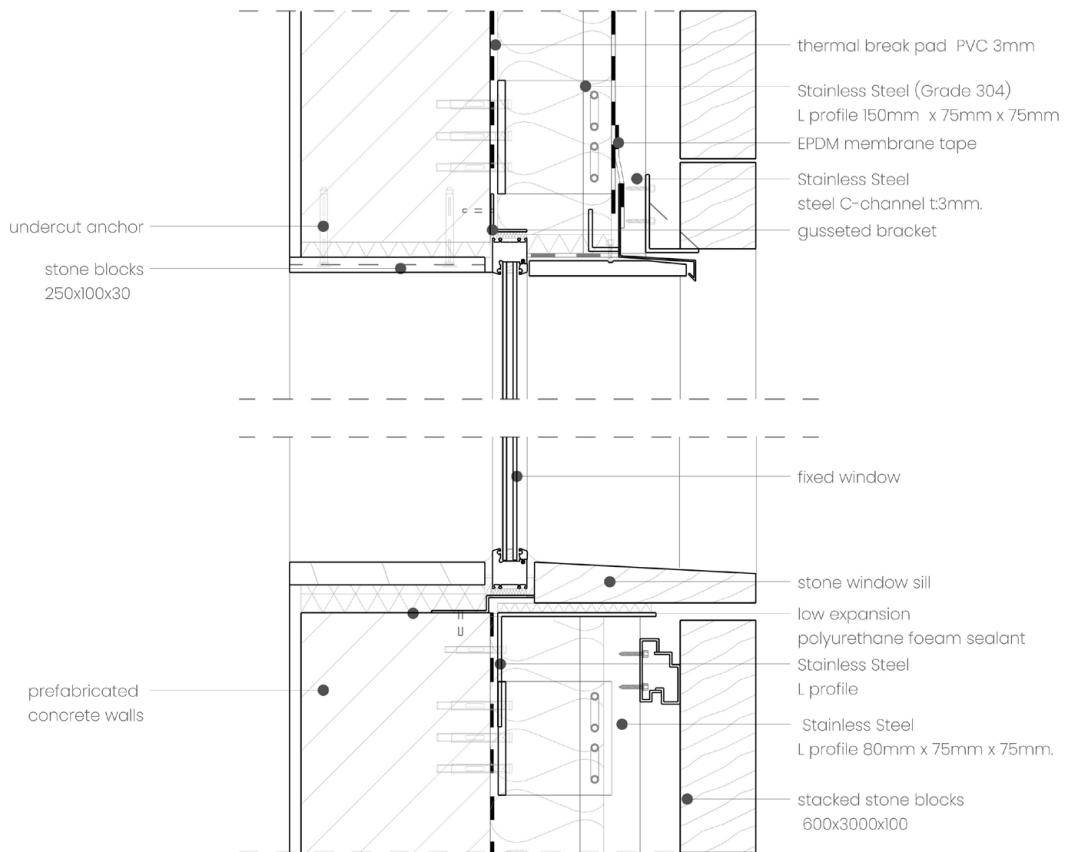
Detail through concrete external wall structure of the concert hall | scale 1:20
